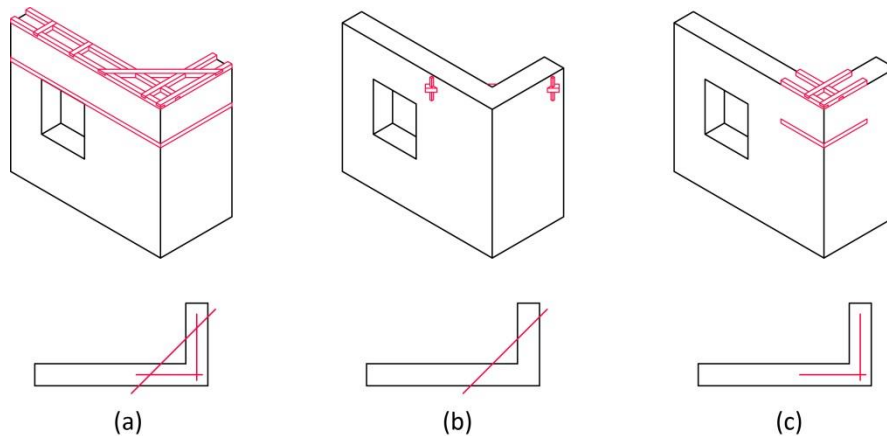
Different types of corner braces traditionally used in vernacular architecture: (a) ring beams with diagonal stiffener; (b) independent corner brace attached to the wall with wedges; and (c) partial ring beam at the corner (Ortega et al. 2017)
